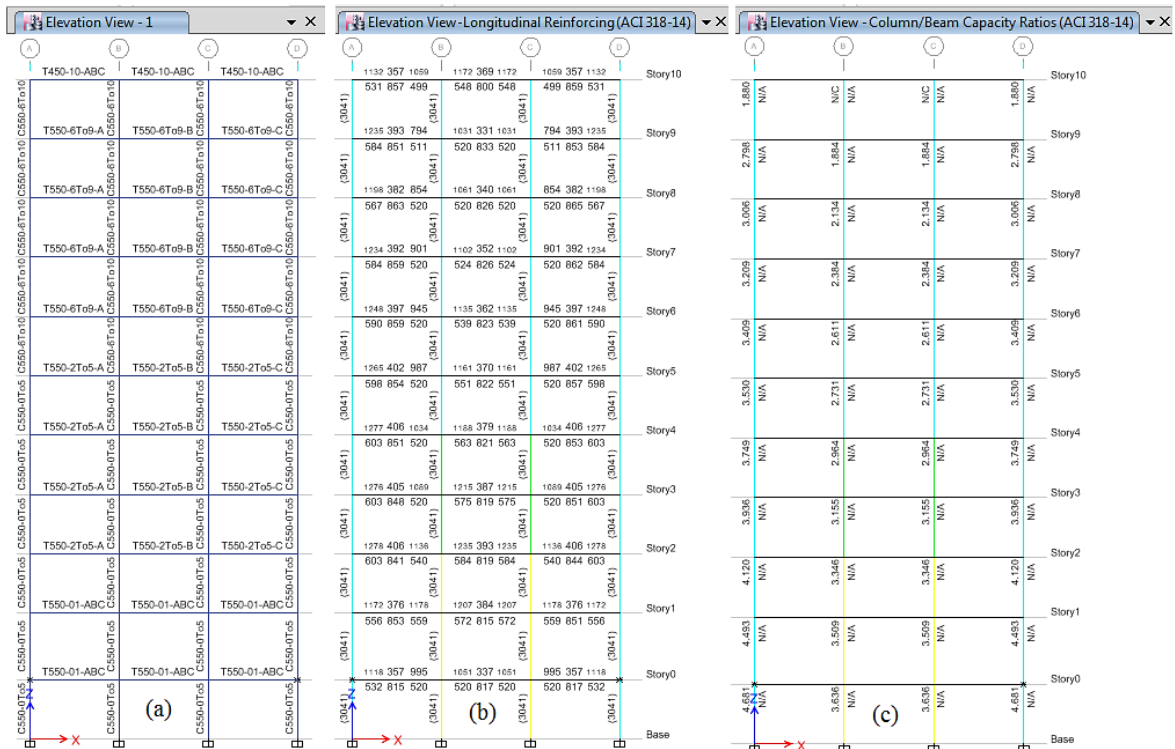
Archetype model frame of 6m bay width and ten stories height; a) Members sections, b) longitudinal reinforcement, c) column / beam capacity Ratios
